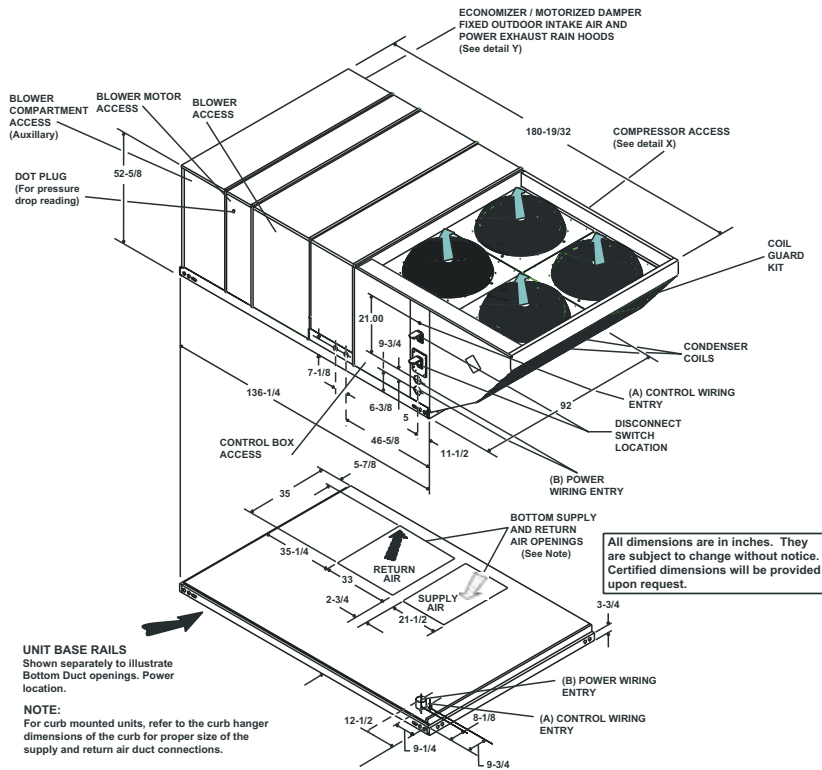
UNIT DIMENSIONS - 20 TON
